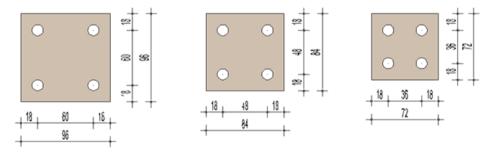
Pile arrangement and capping beam dimensions (in mm)
